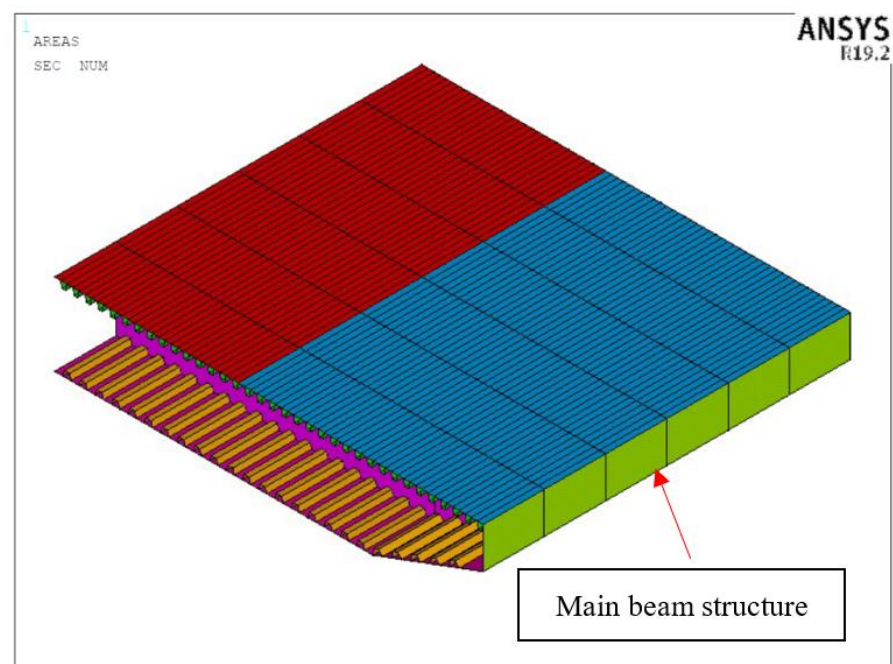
Numerical simulation of steel bridge deck girder structure diagram.
